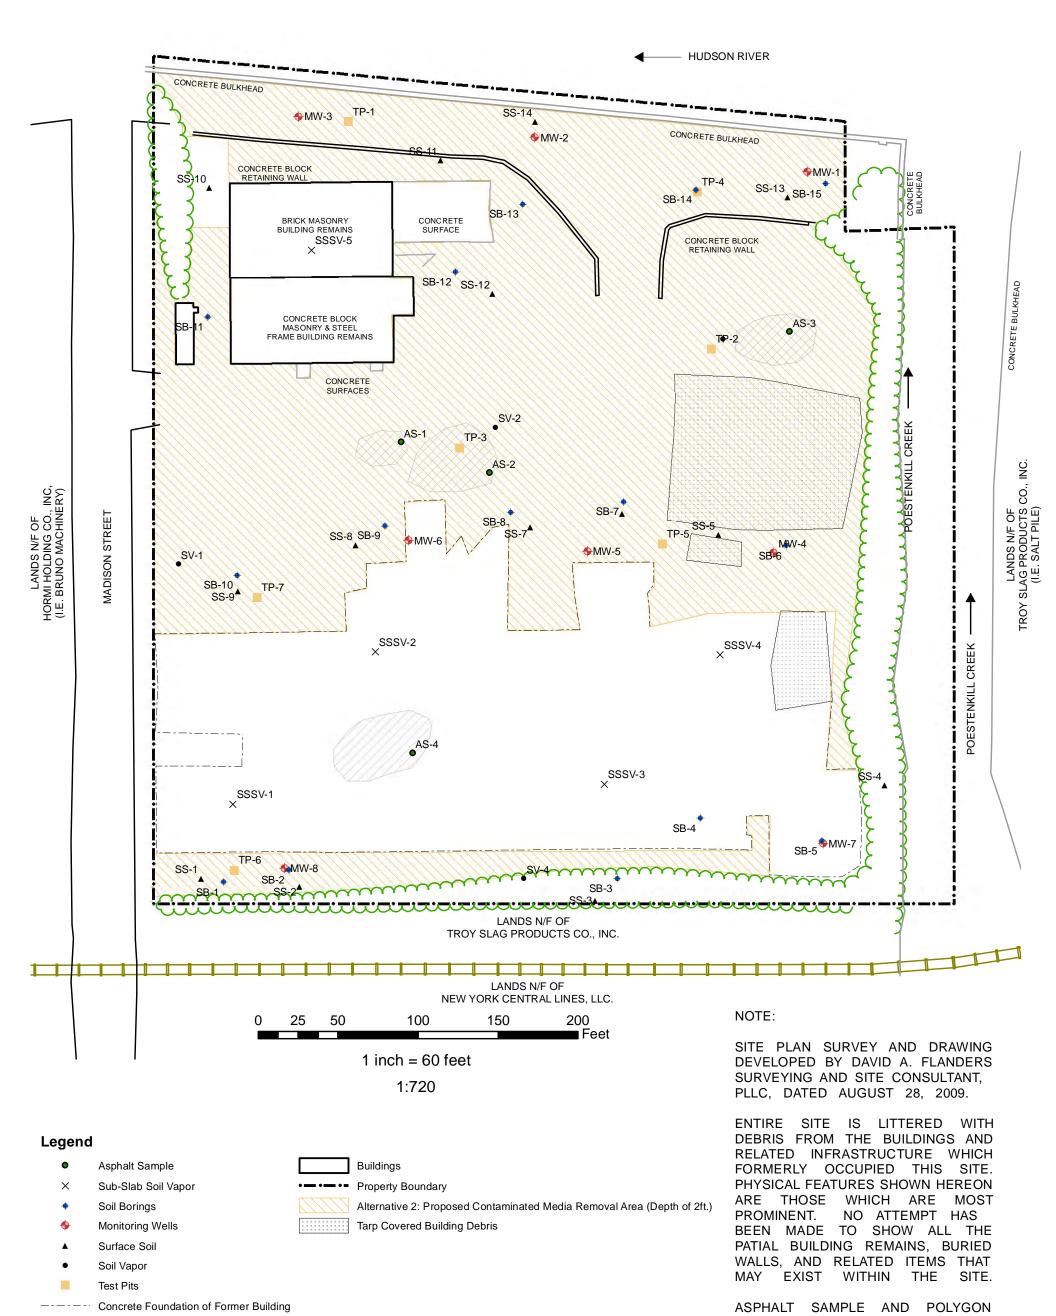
SITE AND SITE BOUNDARIES FORMER SCOLITE PROPERTY 2 MADISON STREET TROY, NEW YORK HRP # TRO2004.P2 SCALE: 1"=60'
